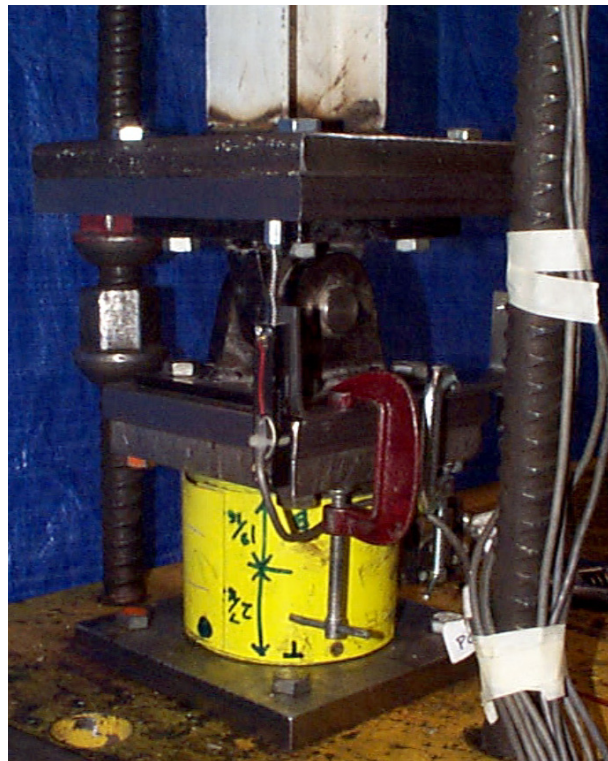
Instrumentation for Beam-Column Connection Specimen (Bottom connection)
